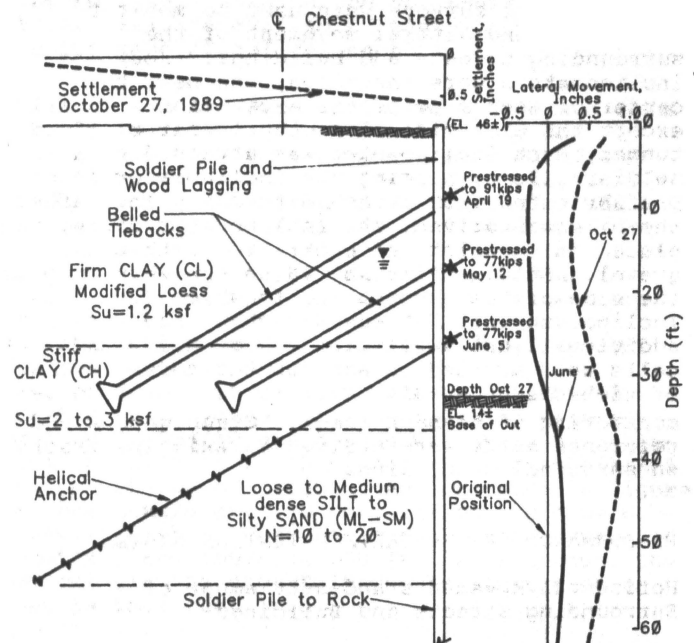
Cross Section at Inclinator No. I-1 near the Center of Chestnut Street
